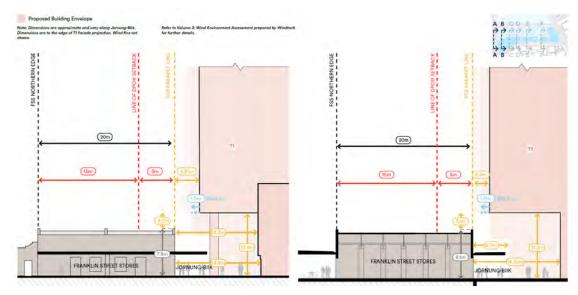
Section of the proposed cantilever and east-west link at Tower 1
